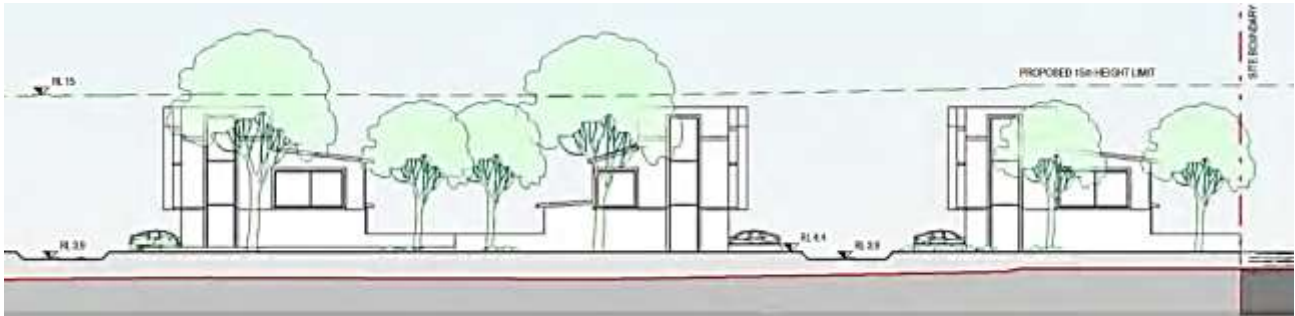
Elevation to Boondah Rd, north end of site next to Meriton complex (extract Buchan Group report)
